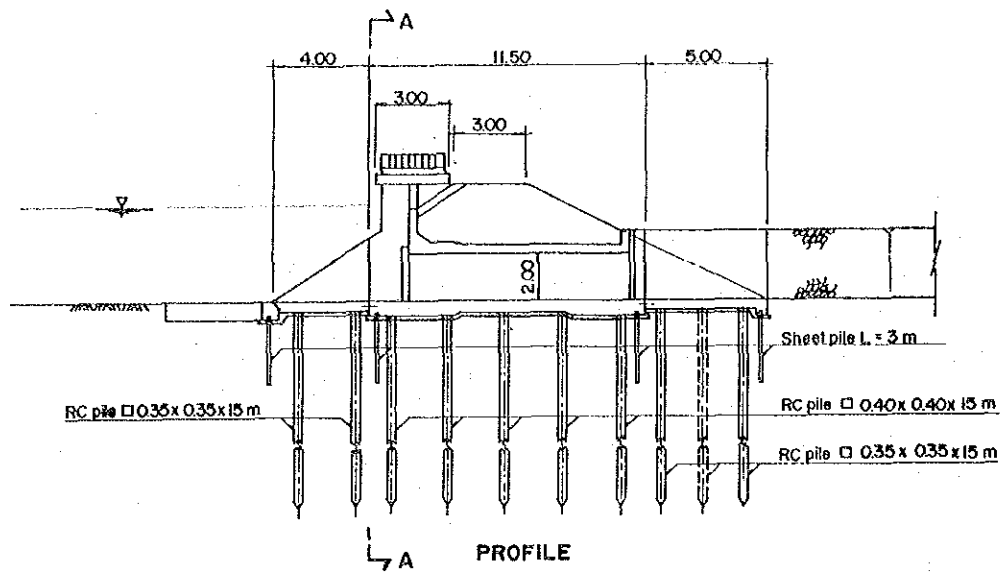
STANDARD DESIGN OF DRAINAGE CULVERT TYPE III (3/3)
